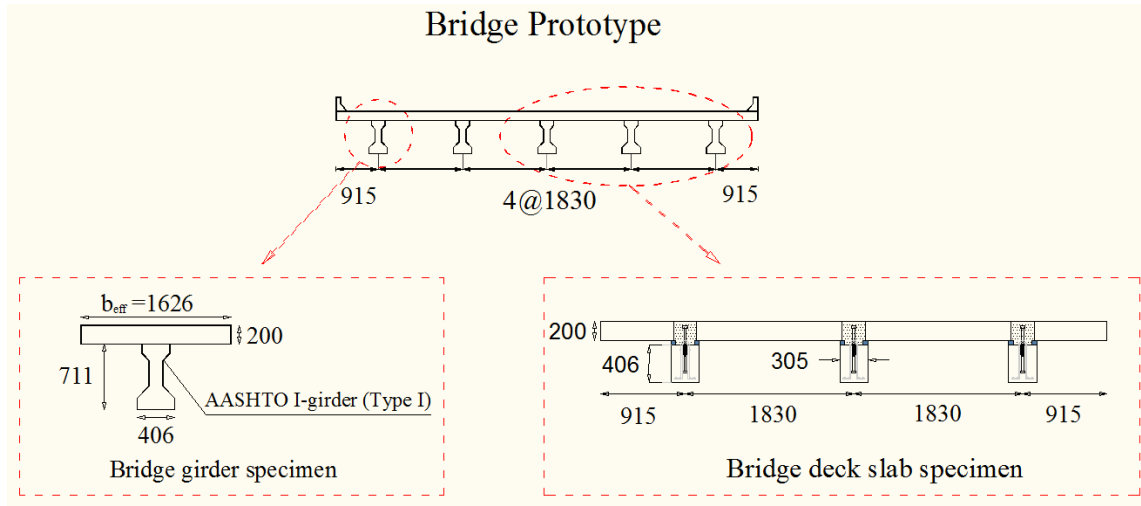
Bridge girder and deck specimens for this study (Dimensions: mm)
